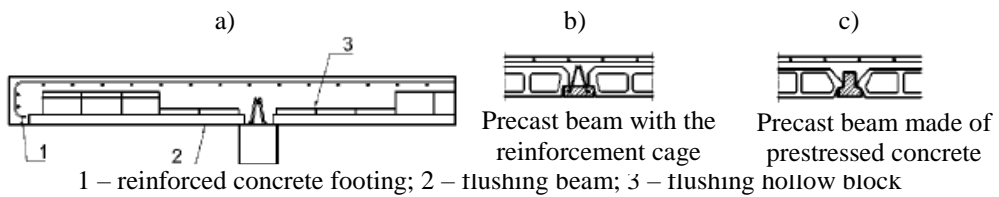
Structural solution for a cantilever overhead of a slab with flushing beams used as non-removable formwork
